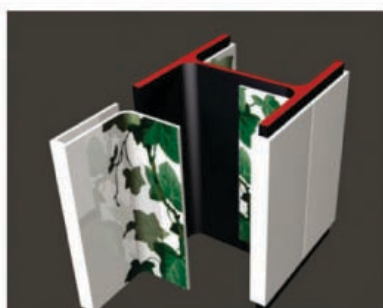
Fireproof ceramic element glued to steel column and clay façade elements in the Convention centre of Peñíscola
